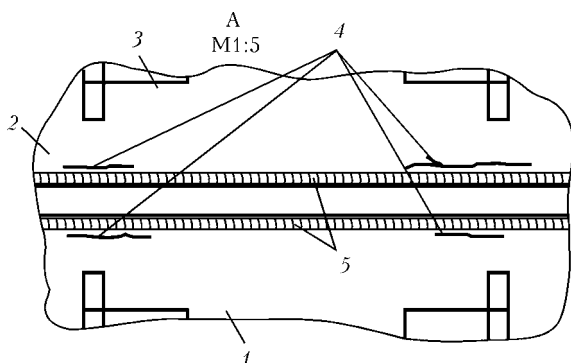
Cracks in the fusion zone of diaphragm weld: 1-4 – see Figure 2; 5 – diaphragm welds
